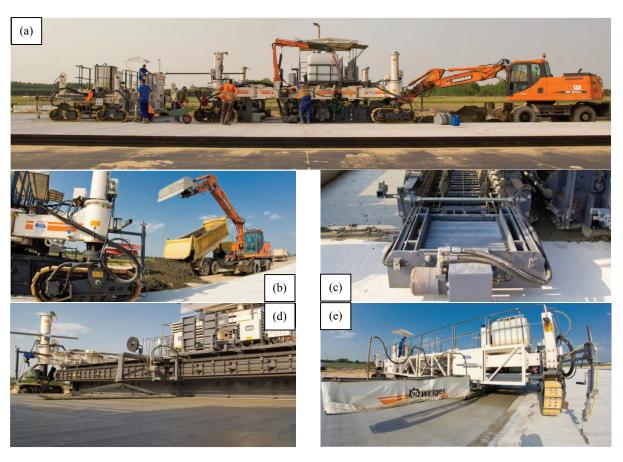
Construction of a concrete abrasive layer of runway in Pyrzowice, (a) view of 3 parts of band laying machine and excavator, and consecutive concrete laying phases: (b) concrete mix supplied for preliminary spreading with the excavator, (c) element of second part of the spreader placing dowels at the width of the band made, (d) waterproof layer sprinkling system, — view of laying the second band of abrasive surface [own study, on the basis of [17]]
